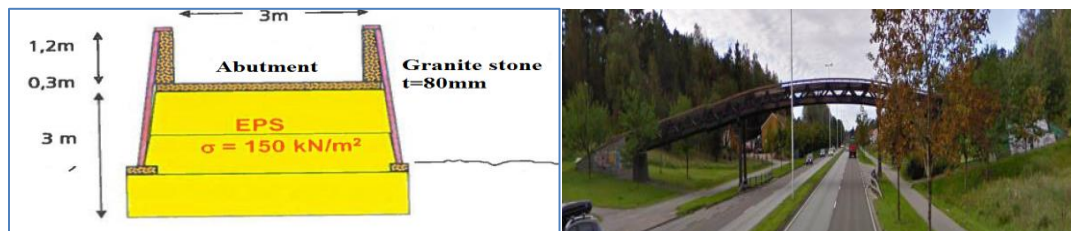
Principal abutment dimension for Leie, Skovbøle and Høiendal bridges;
